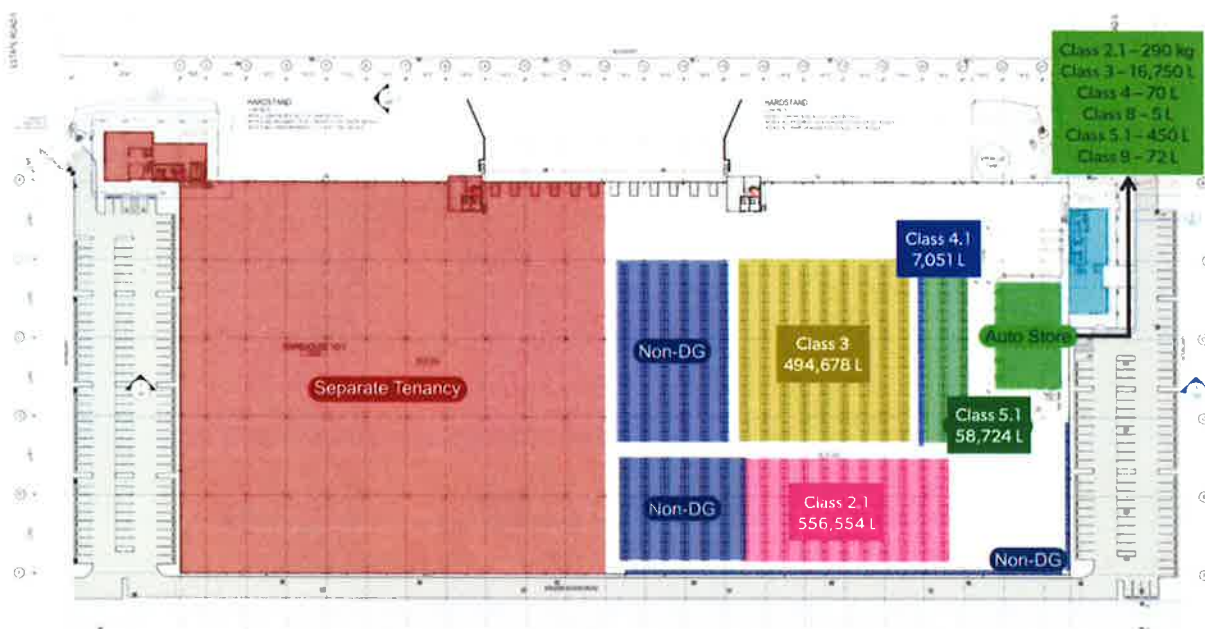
| Proposed Dangerous Goods Storage in Warehouse 1D
